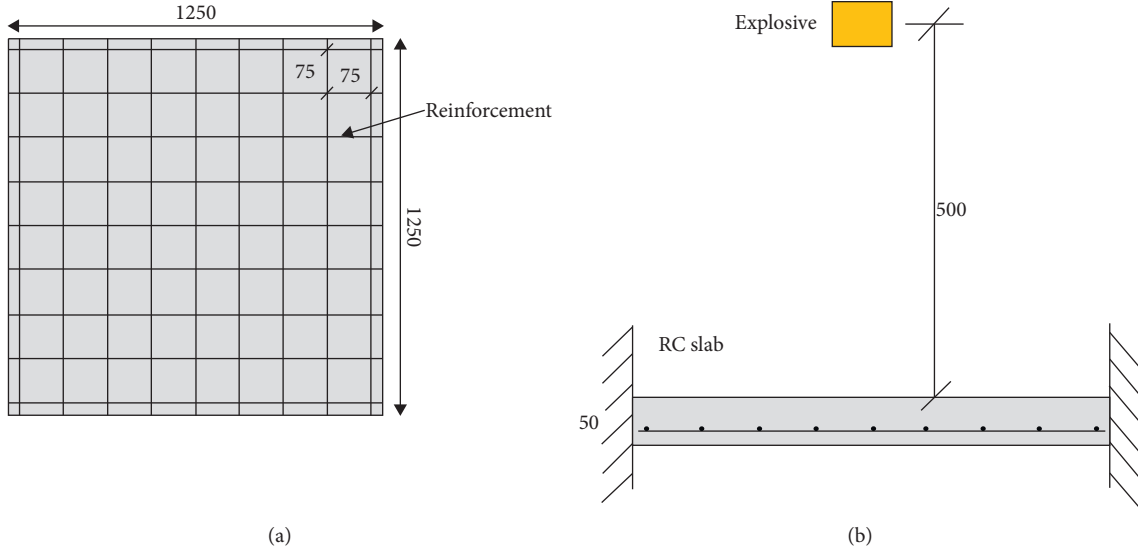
Dimension of the RC slab (unit: mm): (a) sectional view and (b) cross-sectional view.
